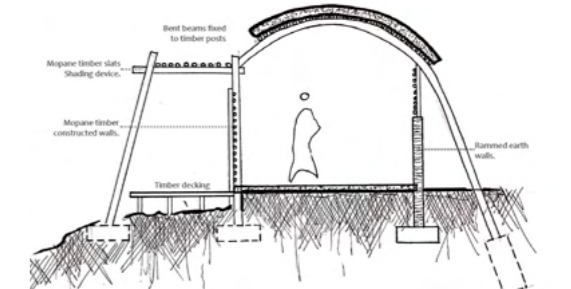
Himba Pavilion Roof Exploration sketch (Author, 2021)
